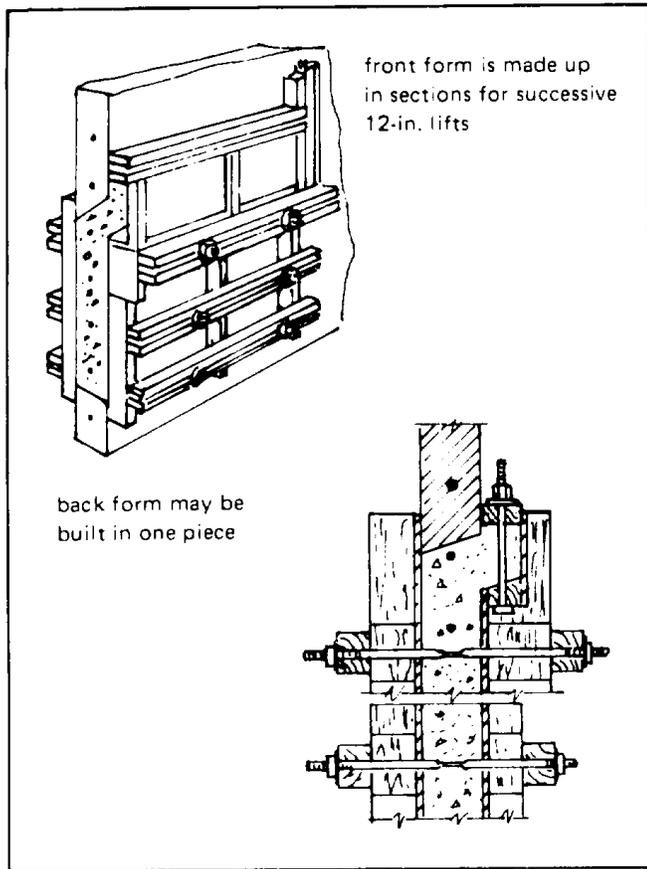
Details of forms for concrete replacement in bulkheads.
